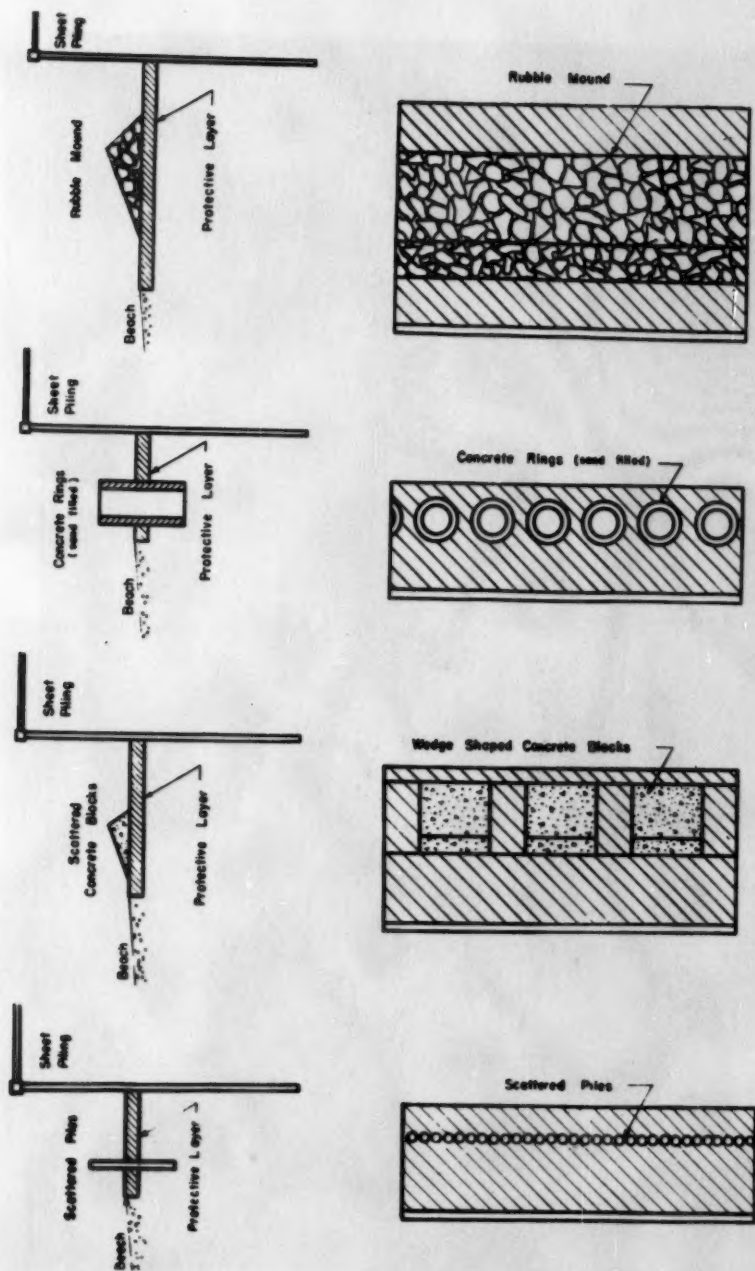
Dividing Reflection at a Sea Wall, Shown Schematically.
